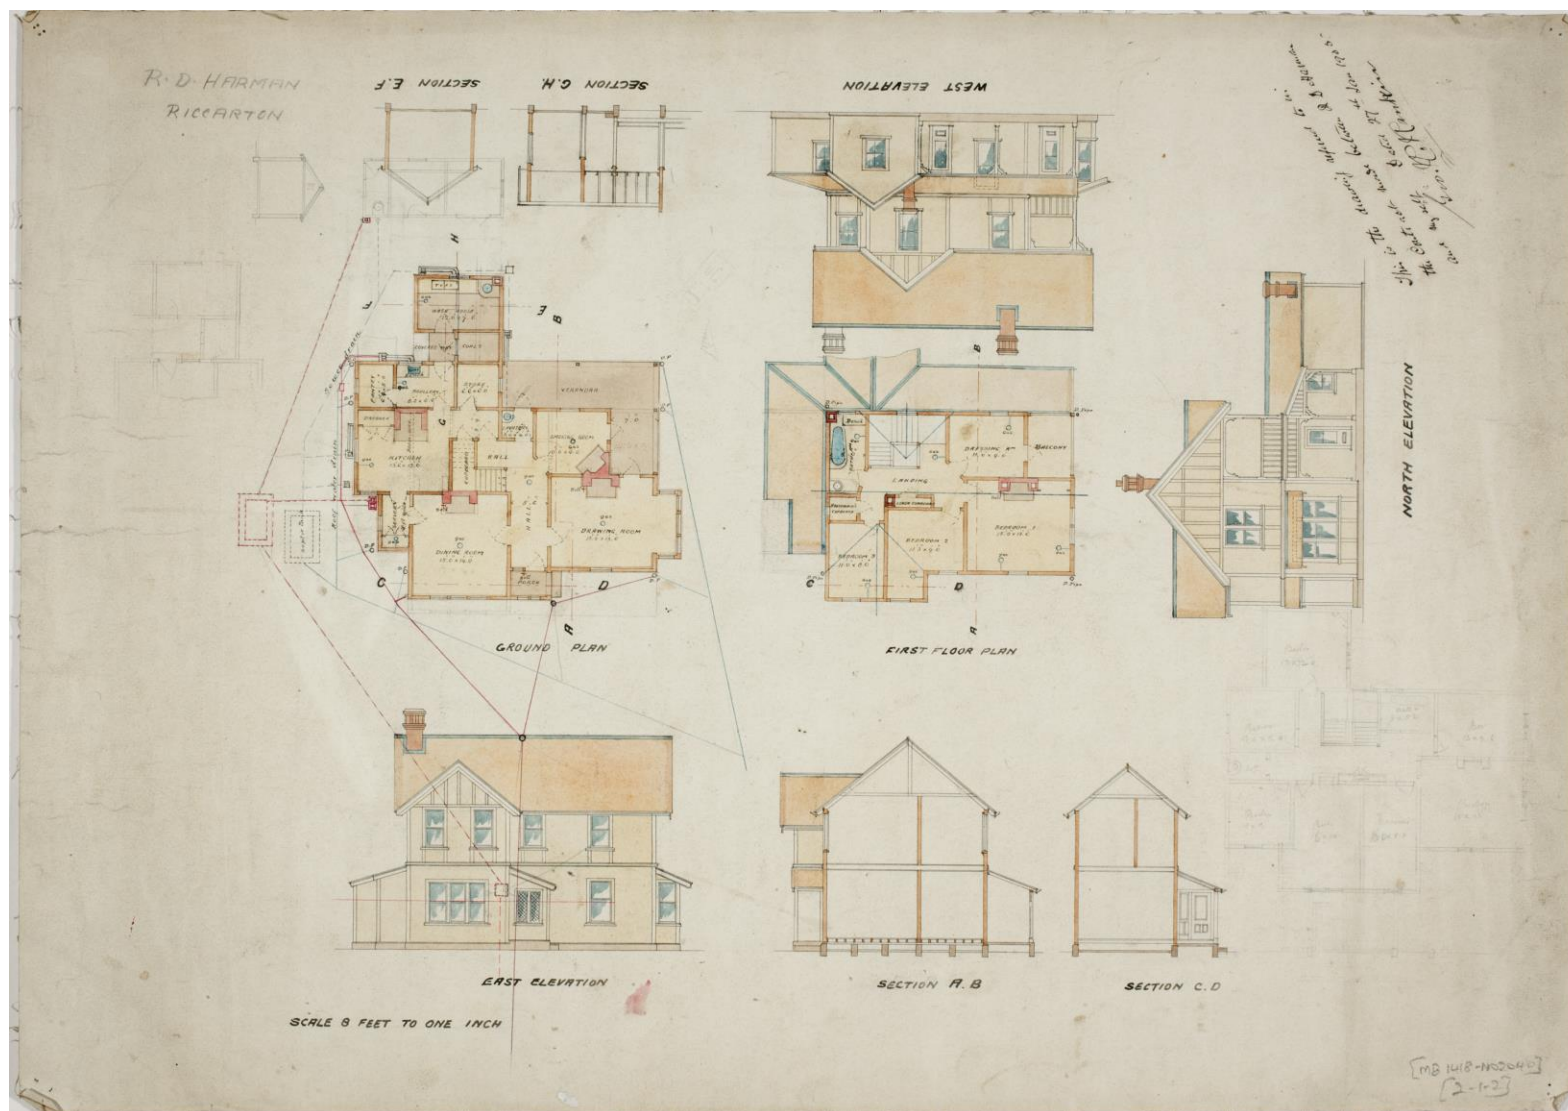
Collins and Harman, R. D. Harman, Riccarton, plans, elevations and sections (1905).
